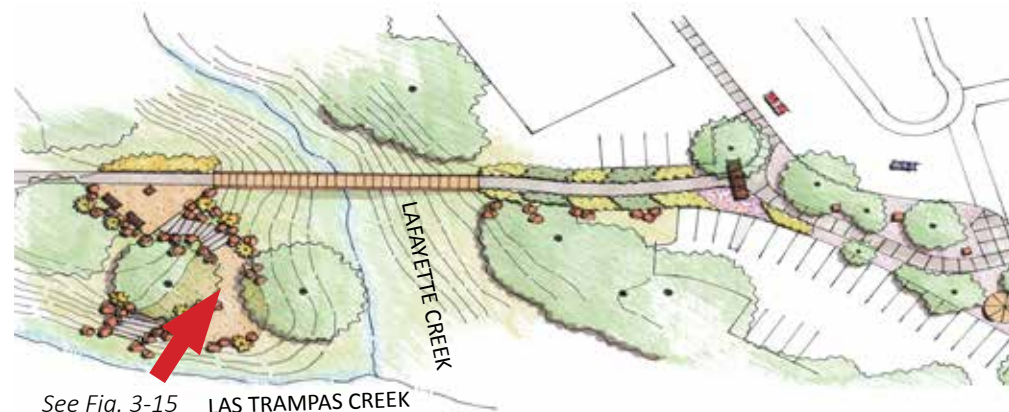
Plan View - Visibility improvements and access to creek terrace
